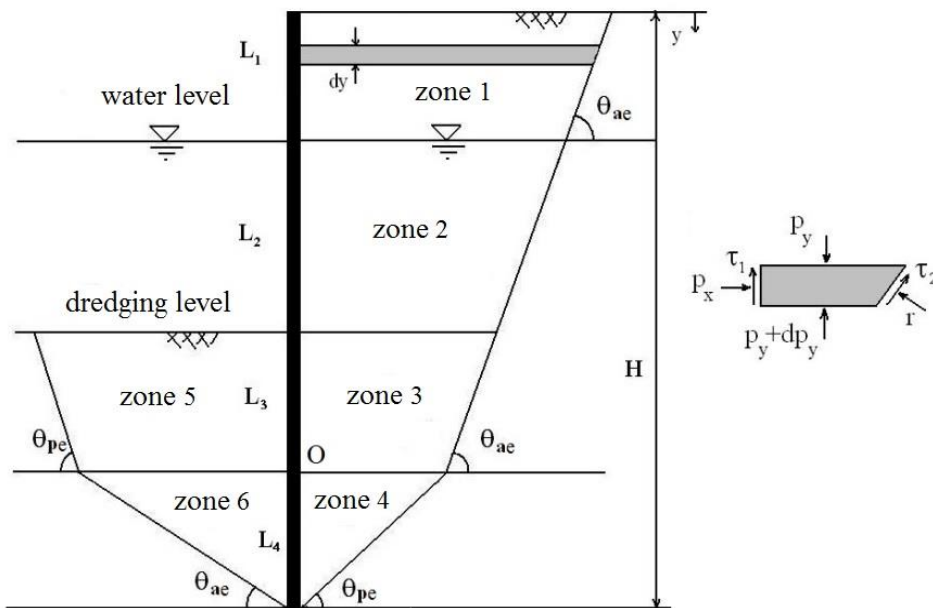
The hypothesis failure surfaces in the both sides of cantilever sheet pile wall penetrating in coarse-grained
